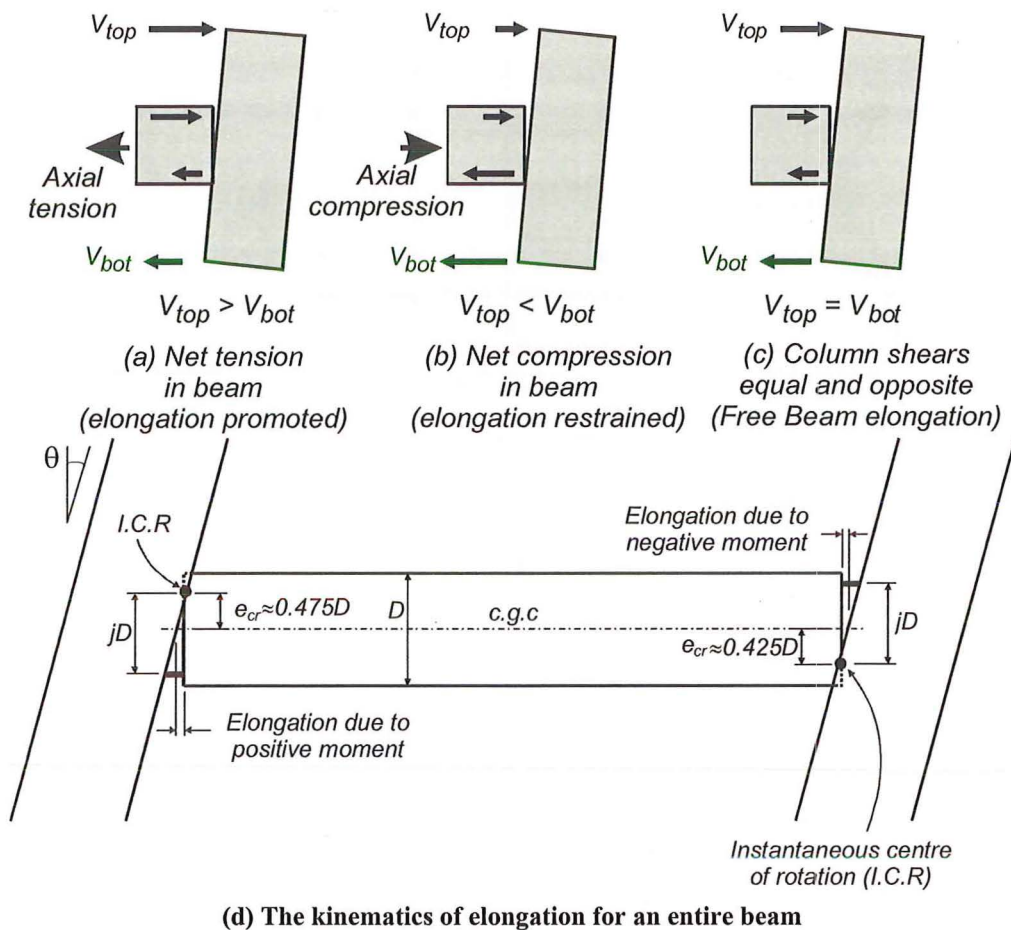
Elongation of concrete beams based on rigid body rotations
